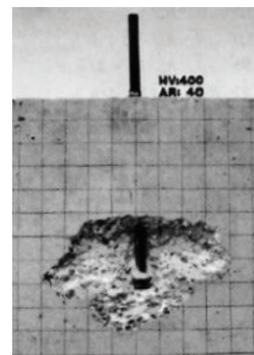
Blowout failure of a deep anchor near an edge. (Picture from Anchorage in Concrete Construction, R. Elgehausen).
